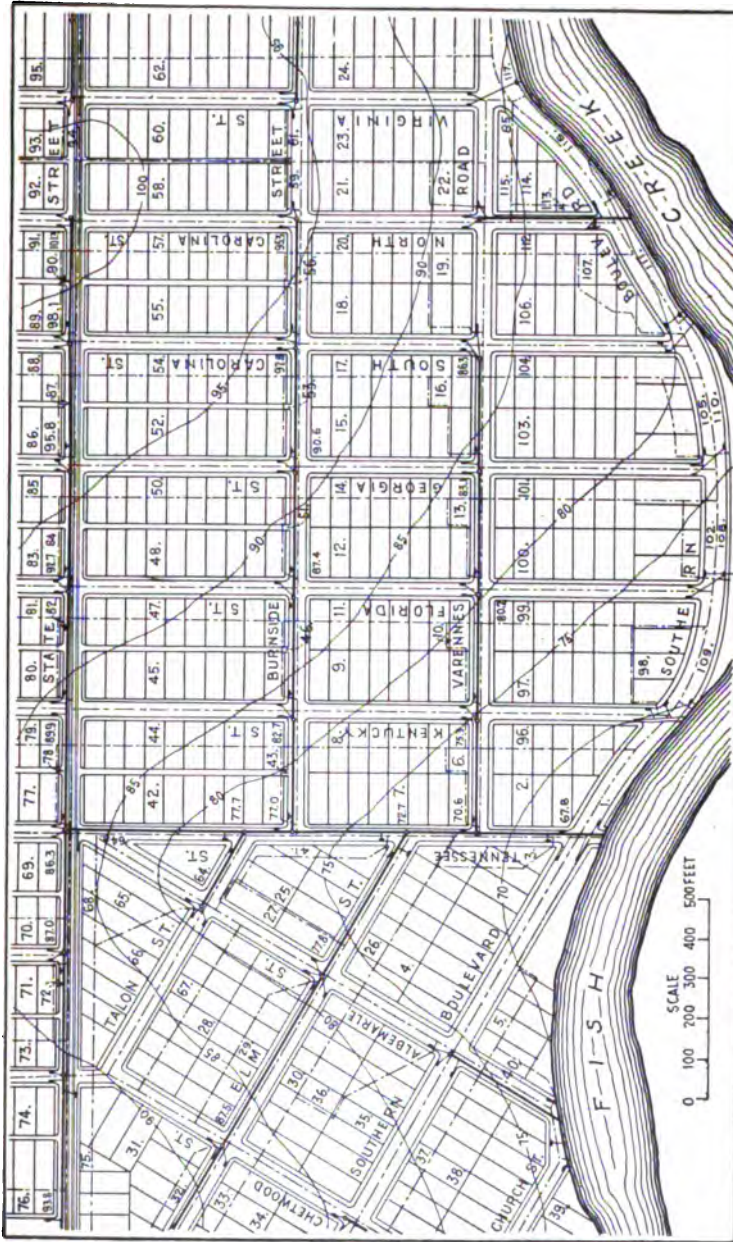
Typical Map Used in the Design of a Storm Sewer System.
